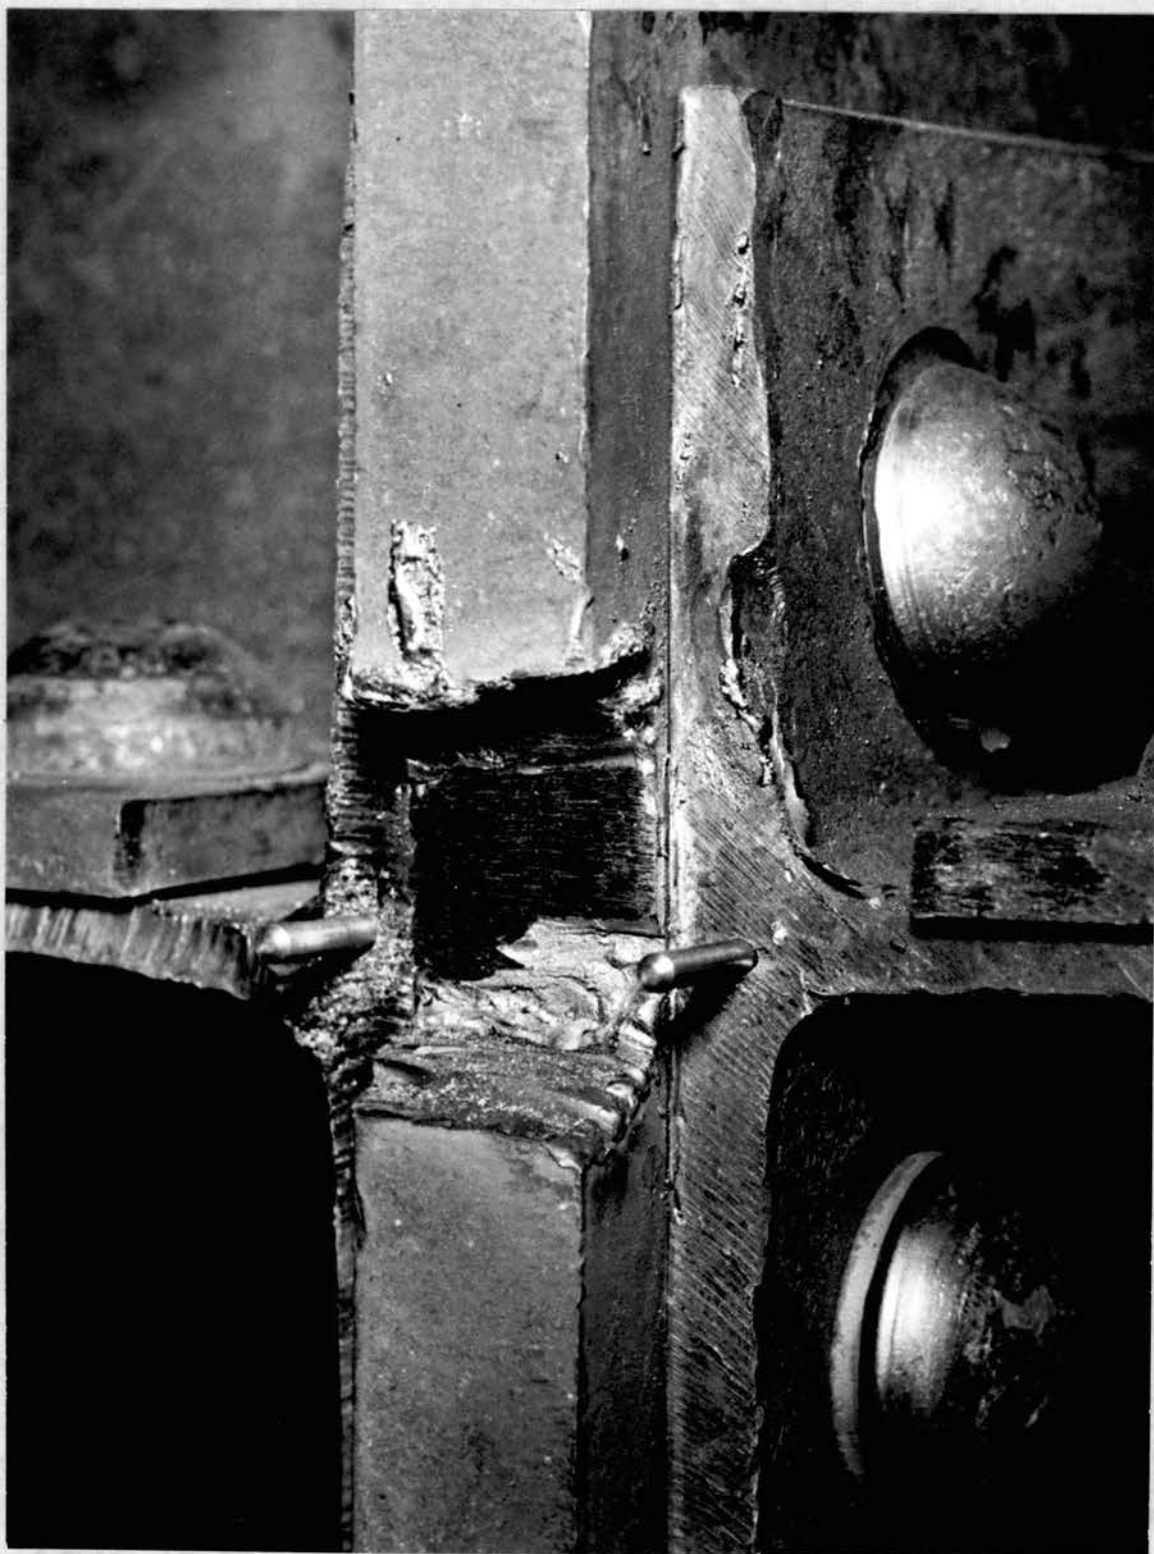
Close up view of Tee flange for Specimen 1 showing crack in Fig. 11 enlarged due to 40,000# total load.
